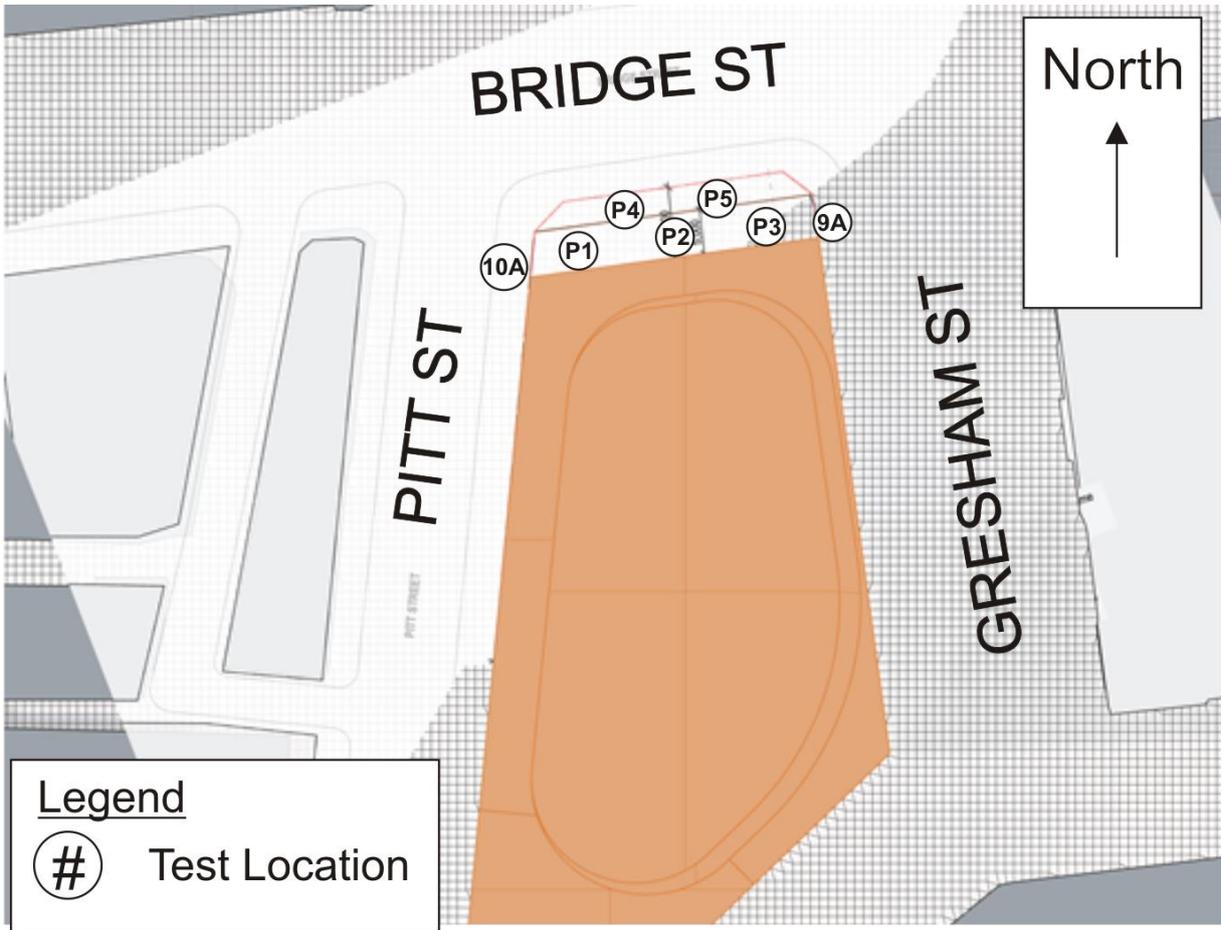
Test Locations in the future Bridge Street Plaza for the Proposed Configuration of the 56 Pitt Street Development, Sydney
